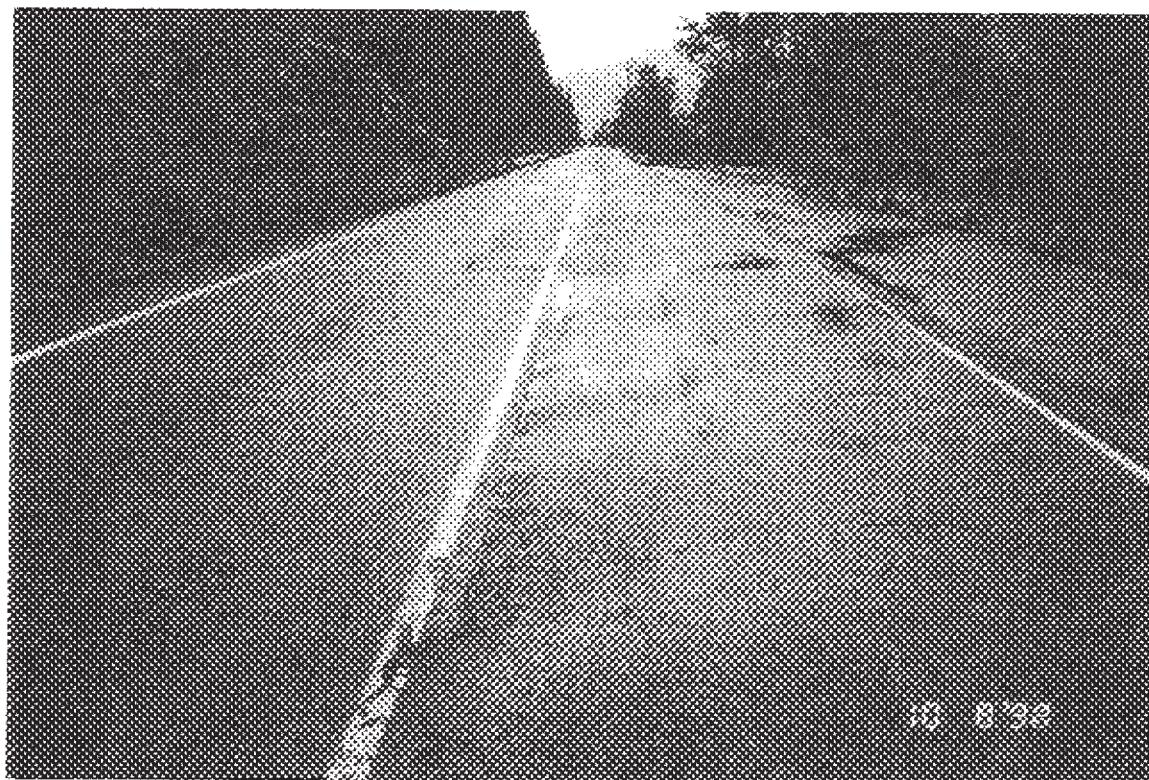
MP 5.10 - Load related cracks in pavement
